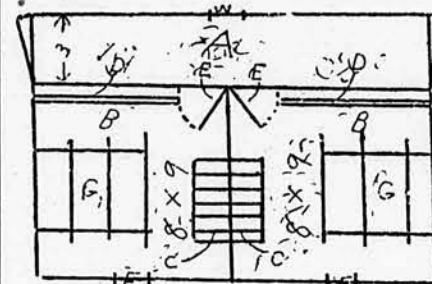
Fig. III. shows floor plan and arrangement of roosting-rooms. A. is the hall, 3x16; B.B. the roosting-rooms, 8x9; C.C. the trap doors, giving entrance to scratching-rooms below. These doors are hinged to open against the central partition, and are opened and closed by cords and pulleys, from the hall. D.D. are the feed troughs, over which are the nests, as shown in Fig. II. at D. E.E. are the doors from the hall to each room, hung to partition, and swinging back against same when open, and arranged to close themselves by spring hinges or cord and weight. F.F. are the windows, made removable for hot weather, and covered on outside with wire netting. G.G. are the roosts, arranged as shown, and hinged to side of house, to be raised when cleaning; outside supported by wires extending to roof or ceiling. Hinges are loose pin butts, pins of which can be slipped out and roost frames removed when necessary, without removing a screw.
